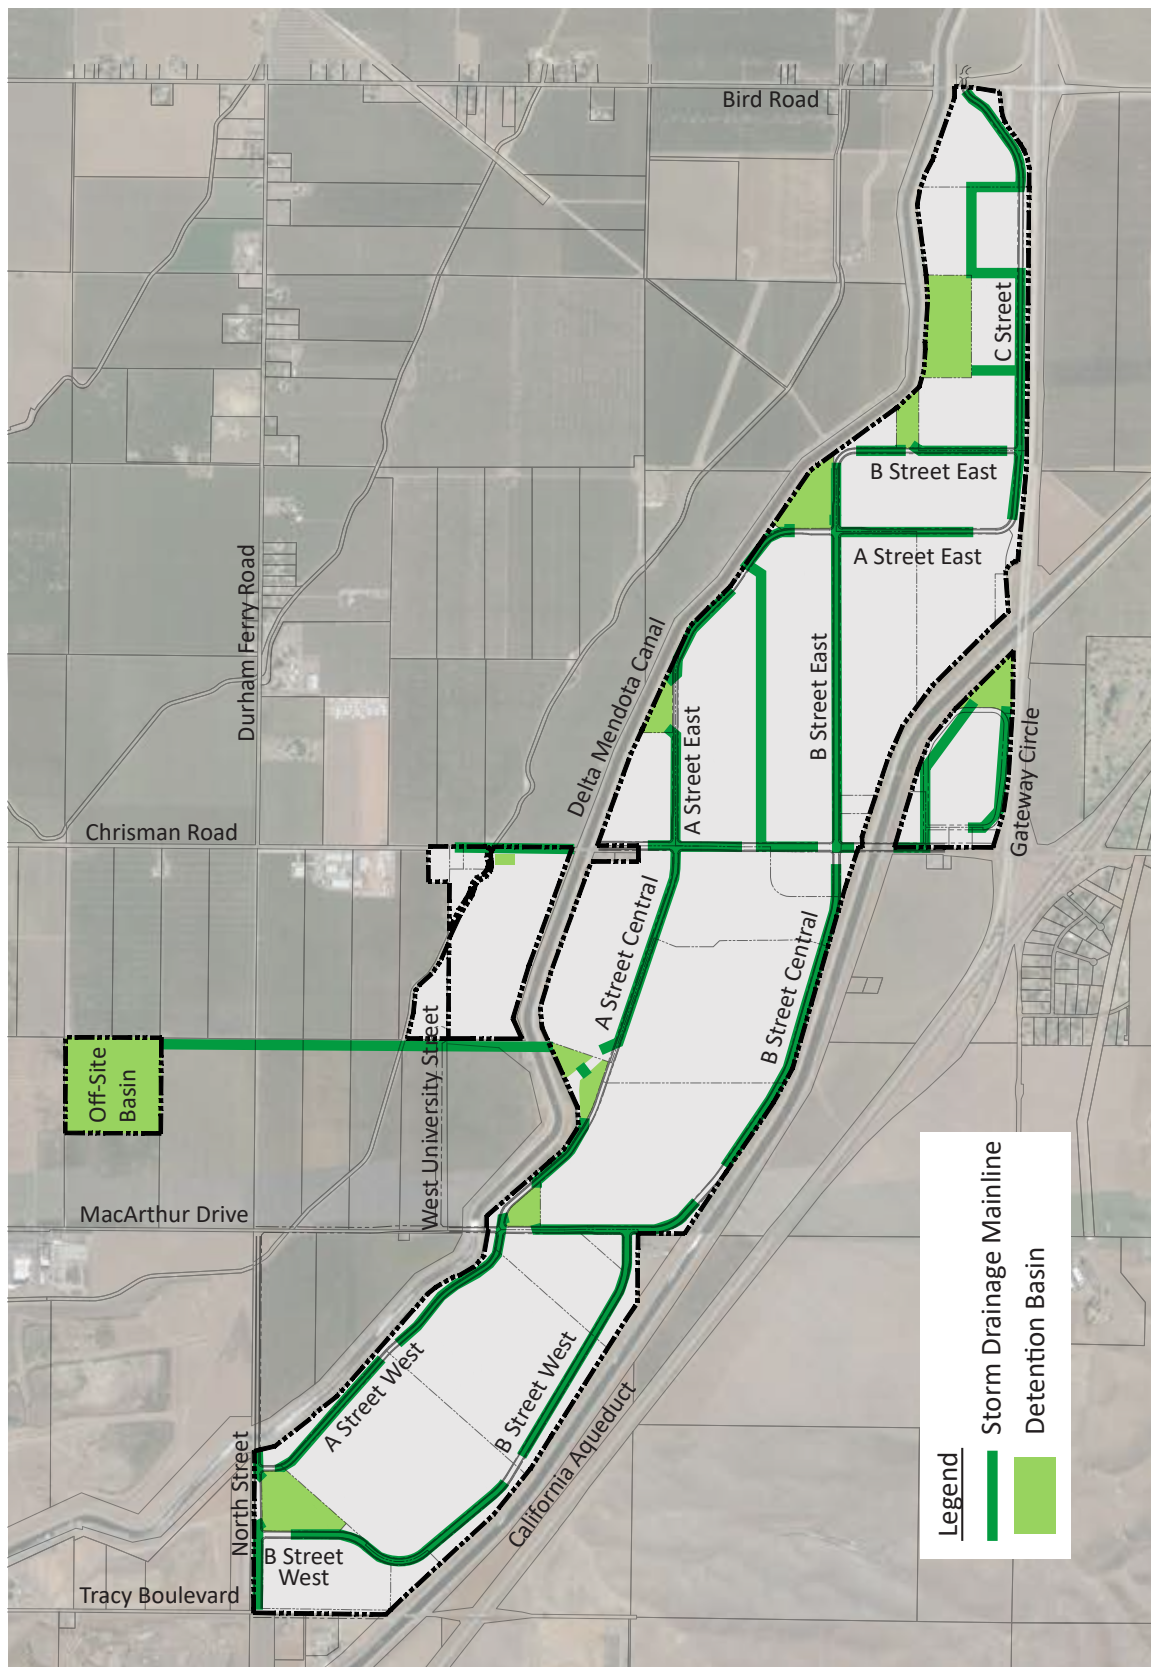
, Conceptual Build Out Storm Drainage Facilities
